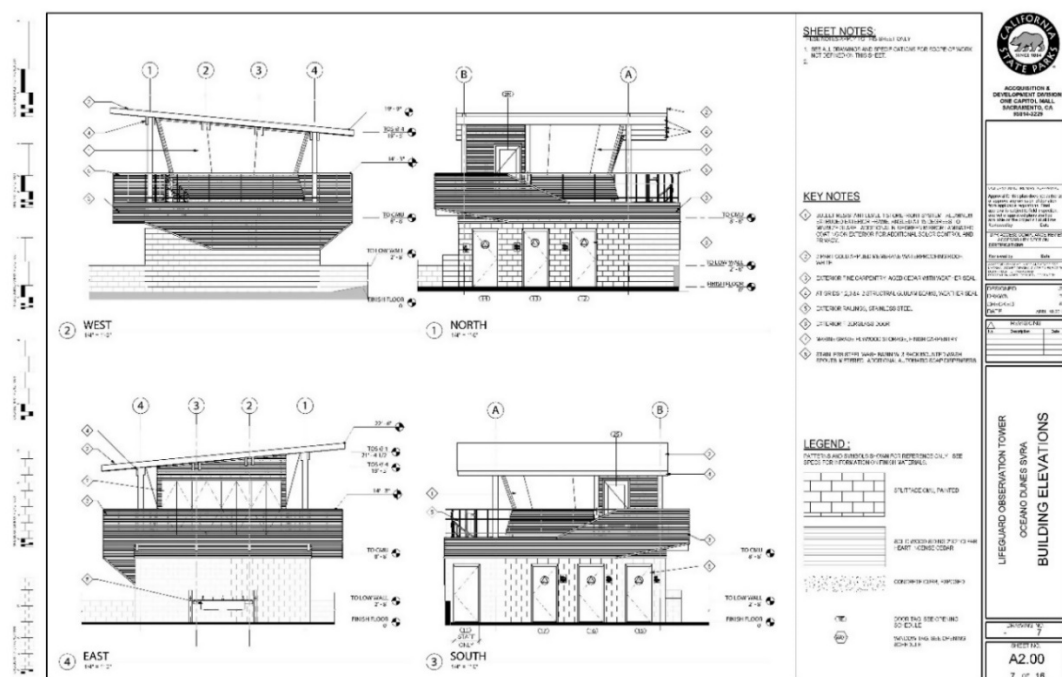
Grand Avenue Lifeguard Tower Elevation
